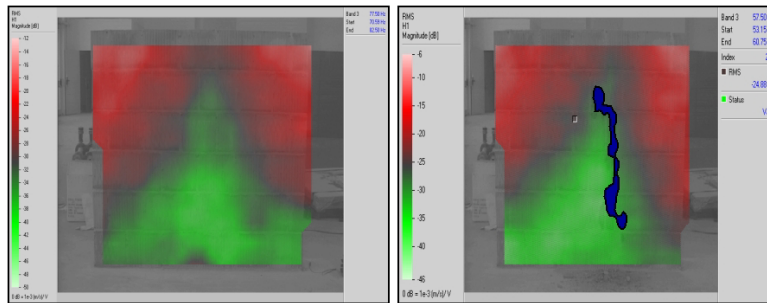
Vibration maps of undamaged (left) and damaged (right) empty bricks (POROTON) wall, at 77.5 Hz and 57.5 Hz respectively; loudspeaker excitation. Black drawing identifies the area damaged by hammering.
